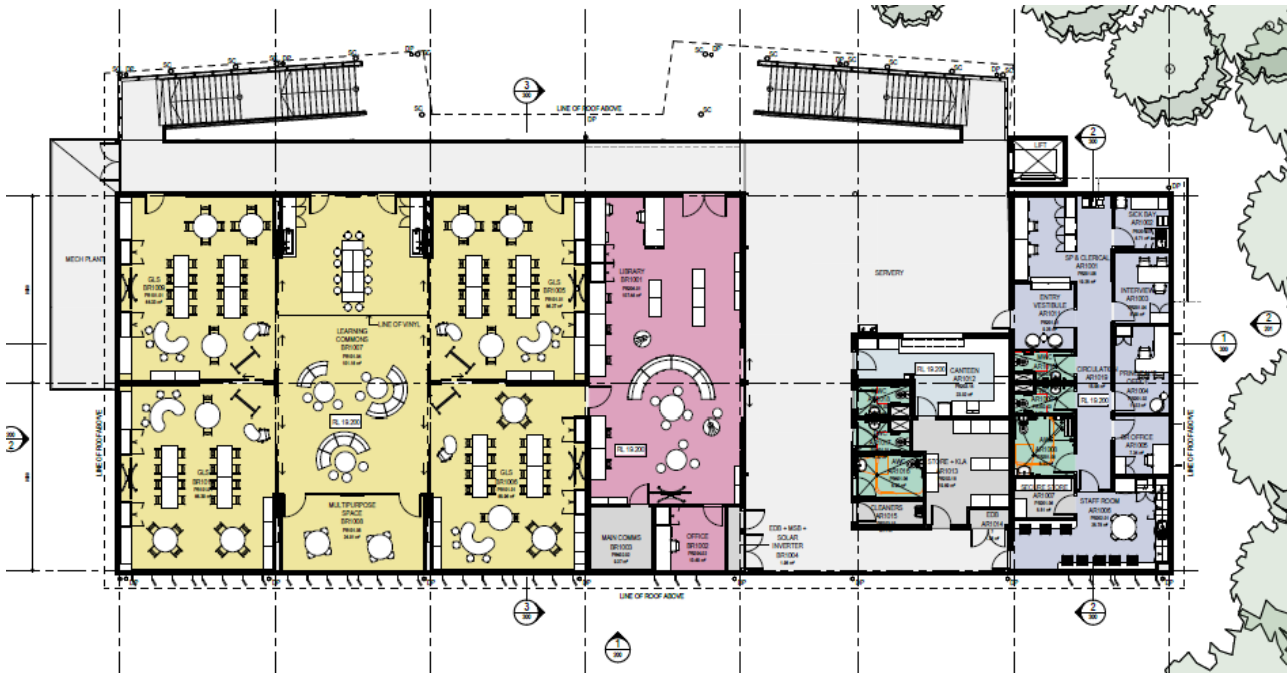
Proposed Elevated Floor Plan (Source: Pedavoli Architects)
